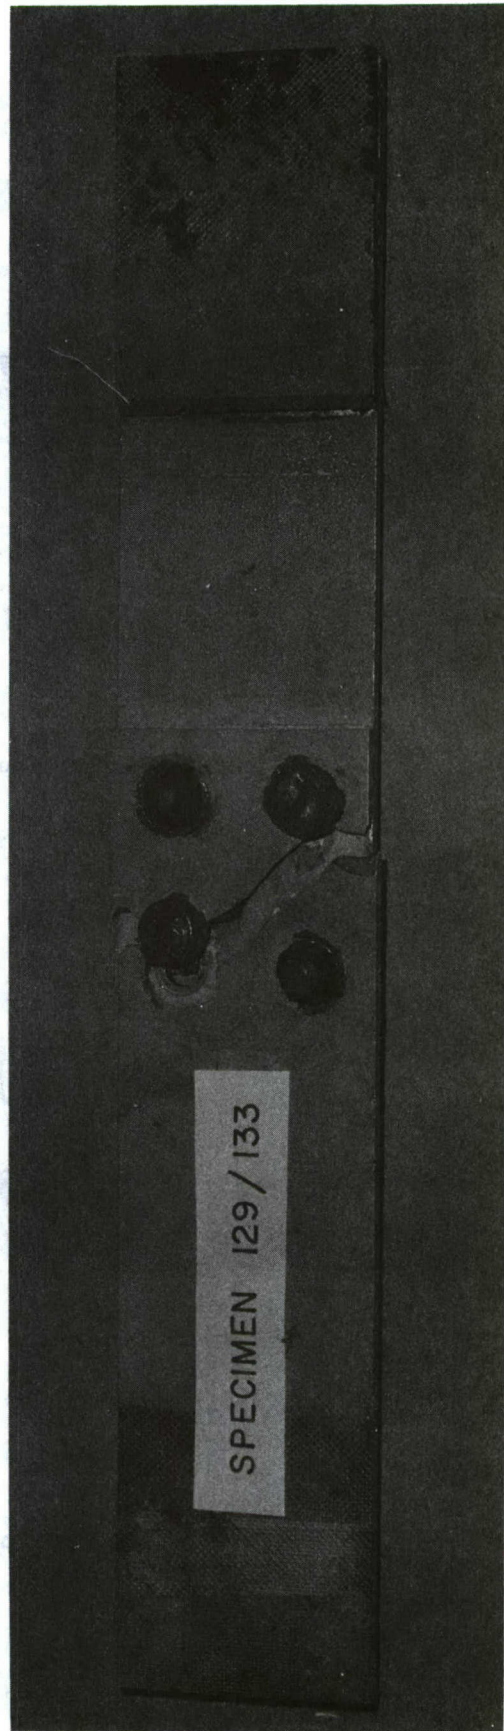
Non-typical Fracture Pattern, Specimen 129/133
